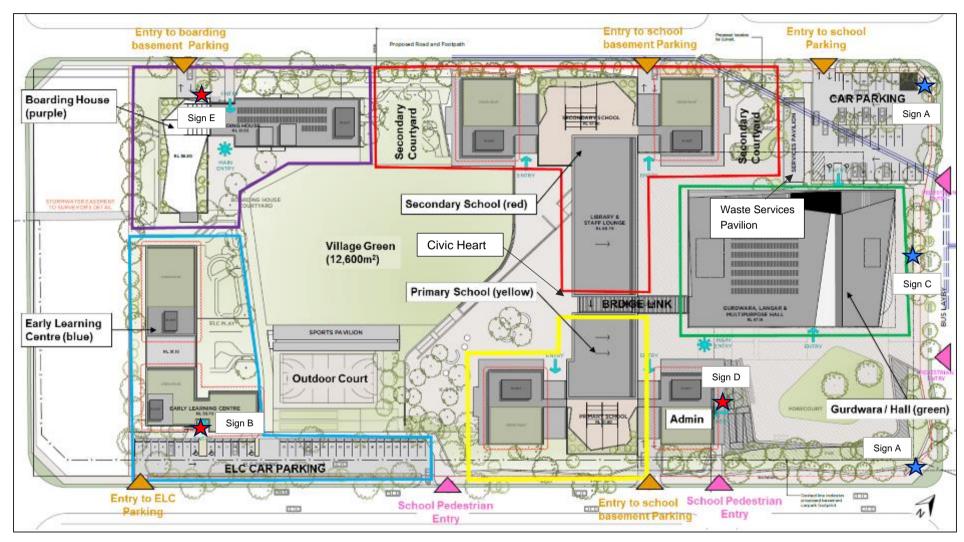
| Proposed site layout (Source: Applicant's RtS 2020)
